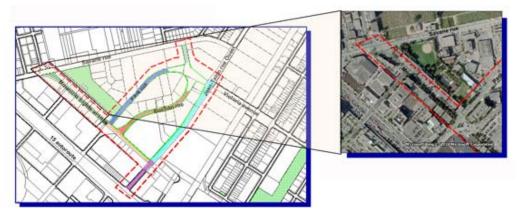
Ffirst section of Mountain Sights Avenue. Source: Borough of Côte-des-Neiges—Notre-Dame-de-Grâce, 2011.
